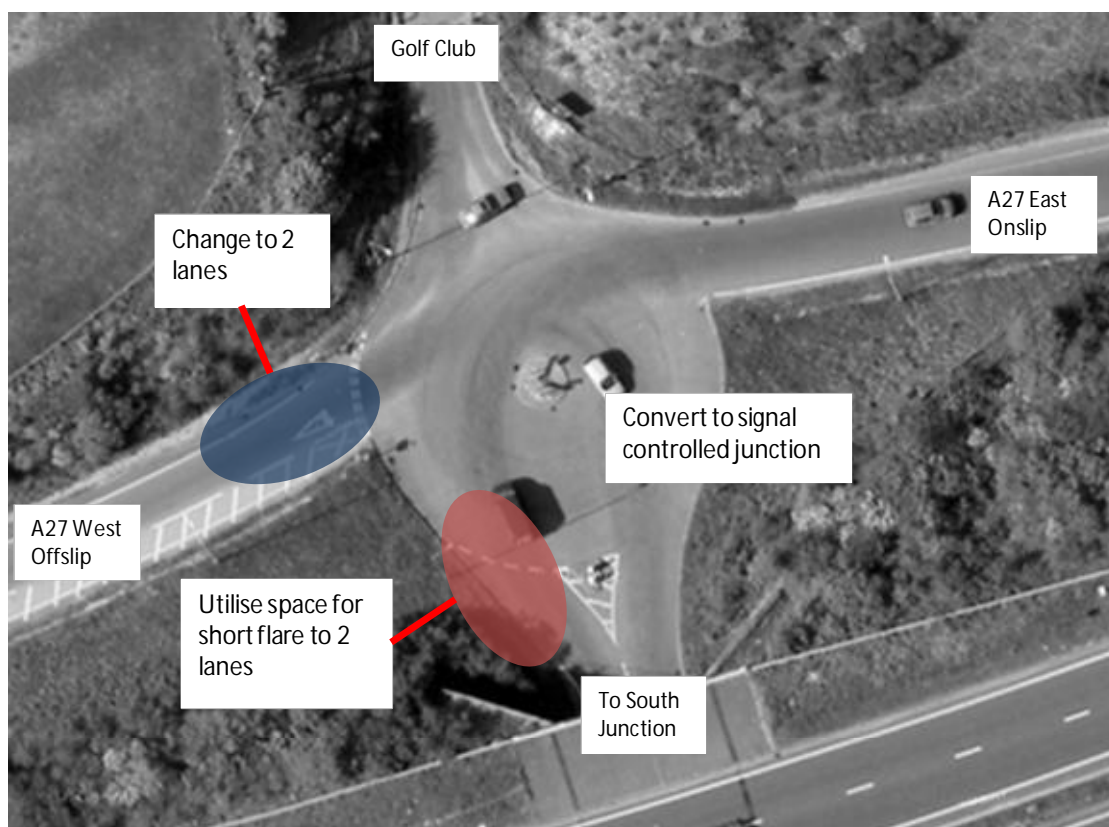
Mitigation Proposals for A27 / Hangleton Link Road North Roundabout
